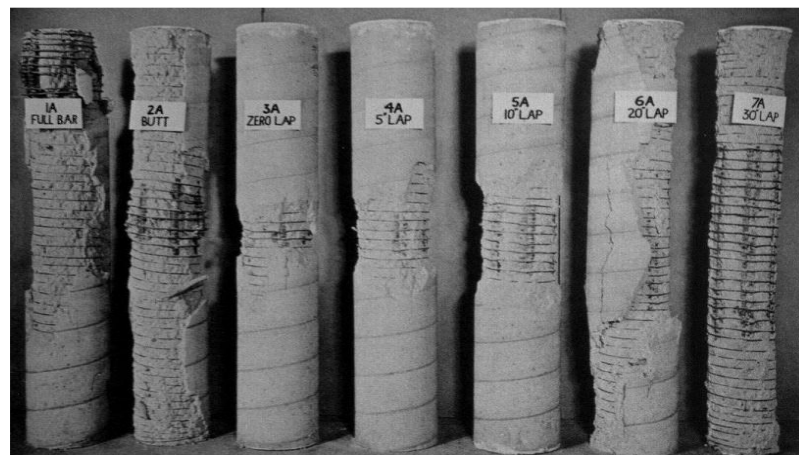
Failure mode of circular columns (Pfister and Mattock 1963).
